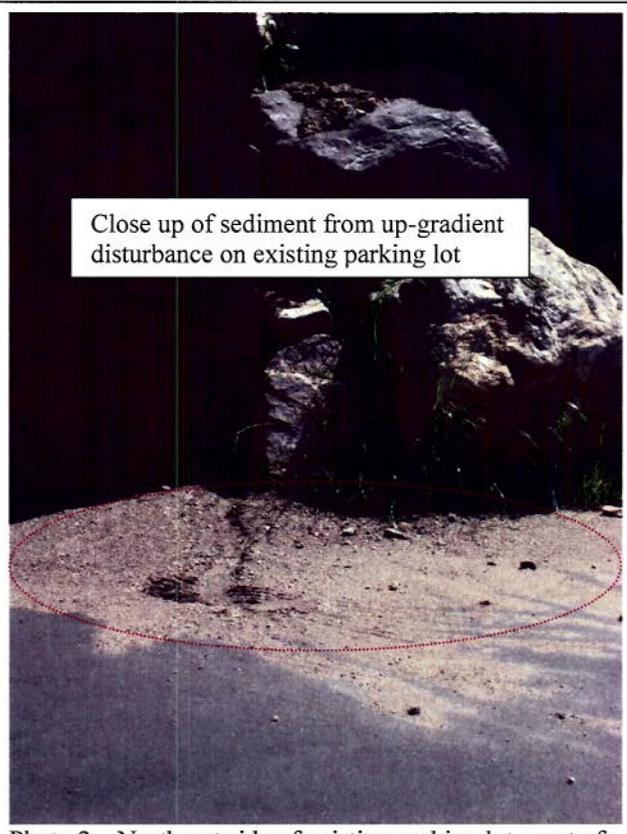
Northeast side of existing parking lot, west of the constructed water tank and wall.
